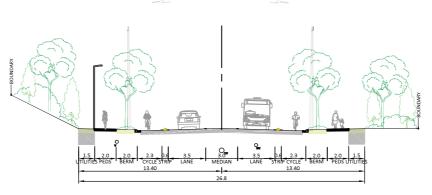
TYPICAL RING ROAD EXTENSION LAYOUT
